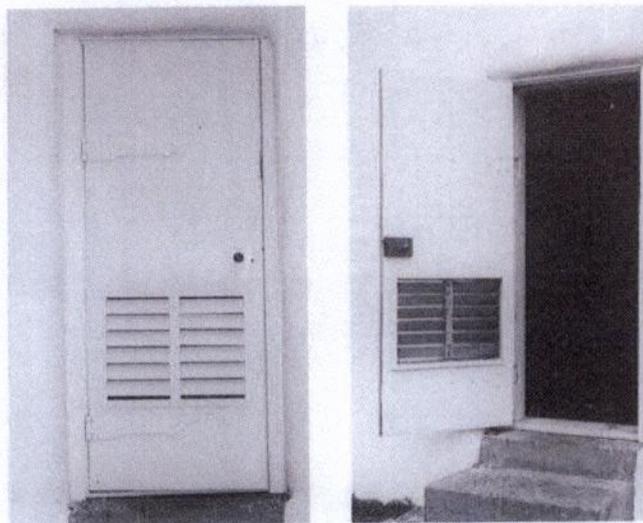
If historic doors would be damaged by adding extra locks, they should be removed and stored and new security doors added. At this lighthouse, the historic door has been replaced with a new door (seen both inside and outside) with an inset vent and new deadbolt locks. The heavy historic hinges have not been damaged. Photo: Williamsport Preservation Training Center, NPS.
